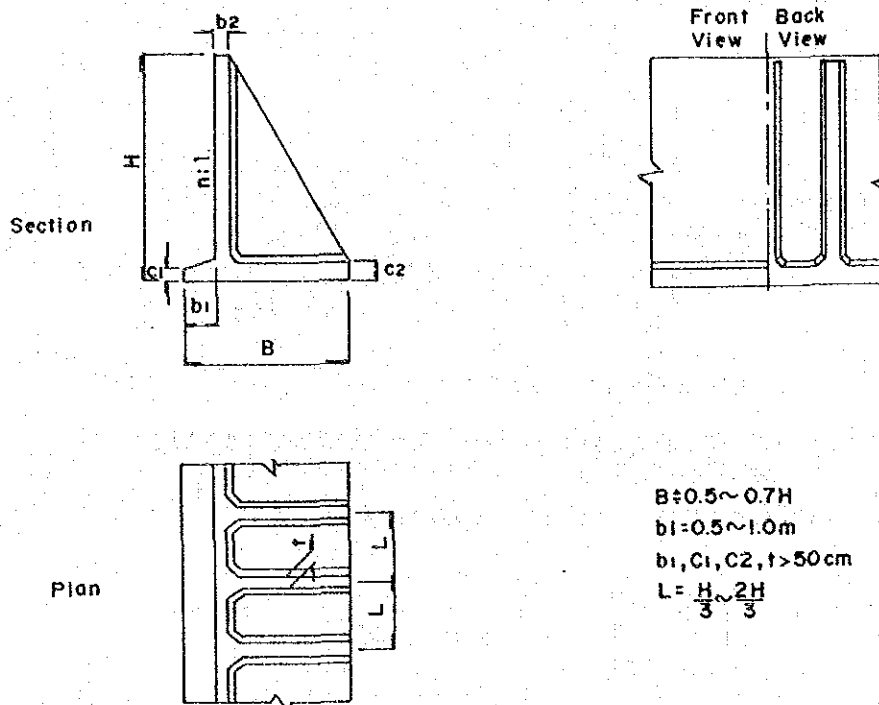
BUTTRESSED TYPE CONCRETE WALL
